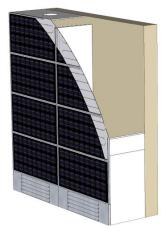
PVT collector installed on the wall with ventilated air layer [80]
